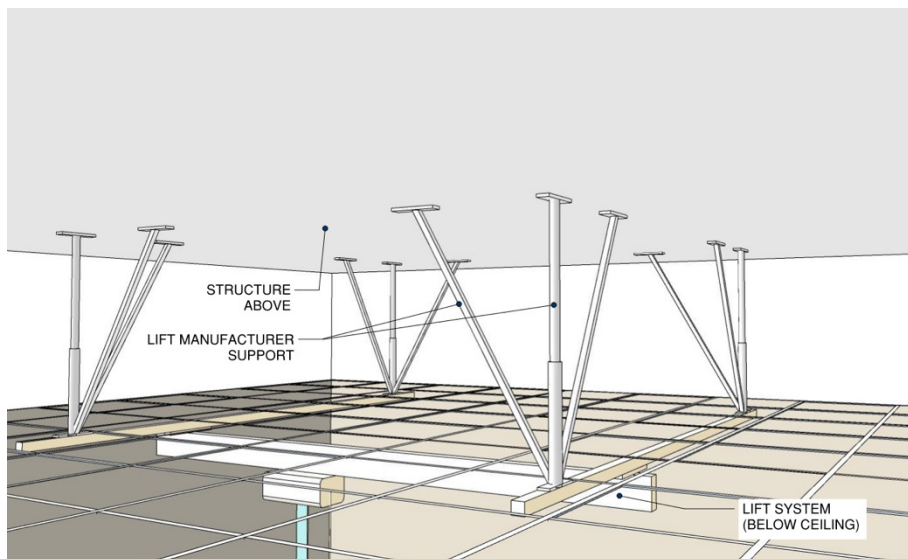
The diagrammatic illustration above represents manufacturer provided supports attached directly to the underside of the structure above. Actual above ceiling conditions may vary. Supports may attach to a concrete slab, steel beams, or other structural elements depending on the building construction. Obstructions such as piping, or ducting may cause interferences to the support system. All above ceiling support systems shall be designed by a registered structural engineer.
